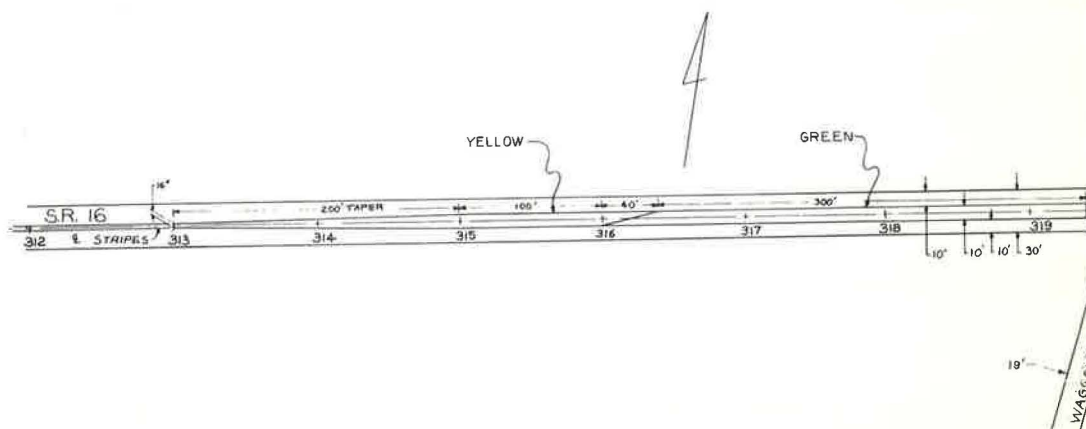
The intersection of SR 16 and Waggoner Road showing details of colored asphalt.
